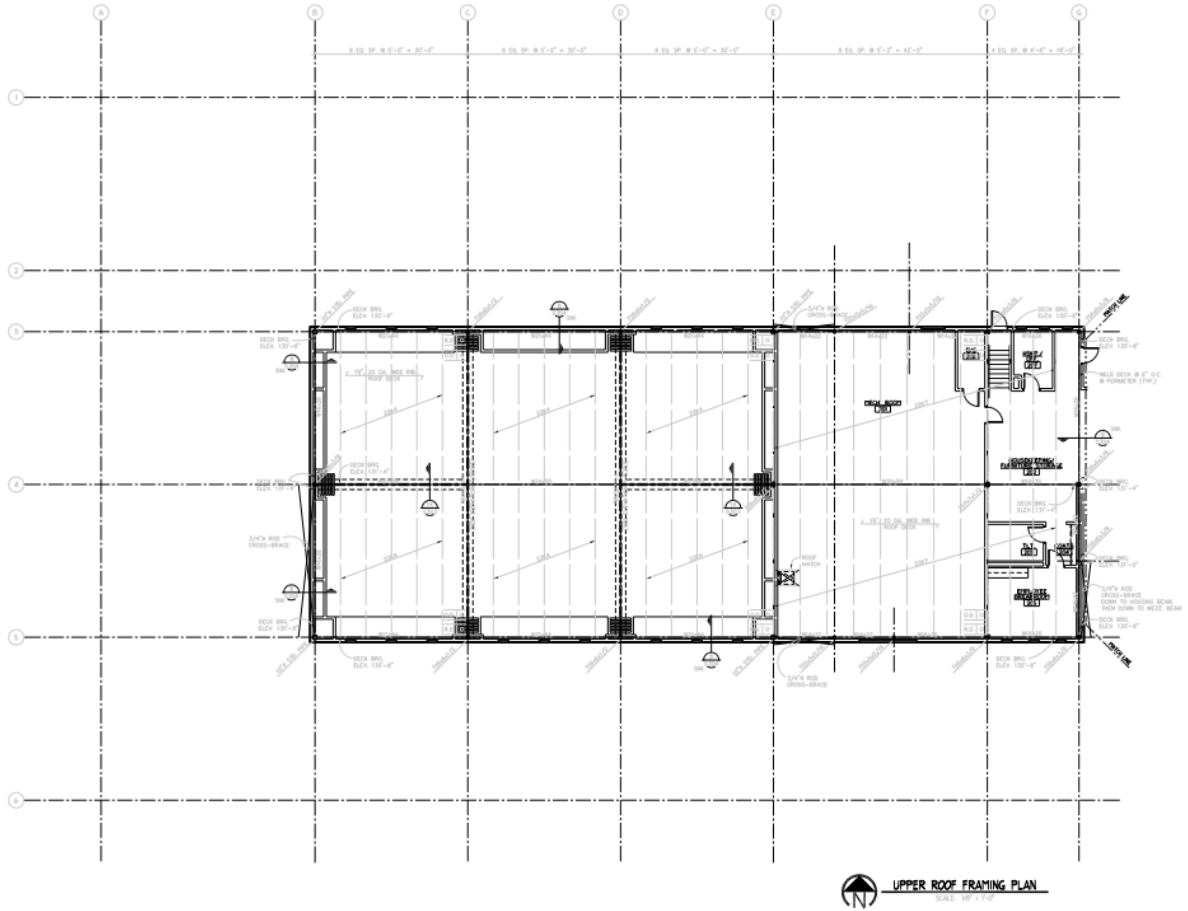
Prince Conference Center Roof 2 Framing Plan.
